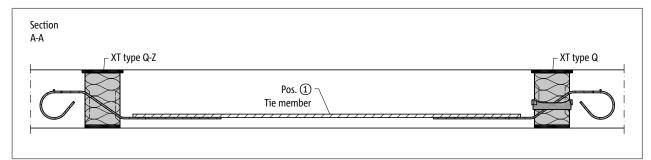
Schöck Isokorb® XT type Q-Z-V1 to Q-Z-V4, Q-V1 to Q-V4: Section A-A; one direction spanned reinforced concrete slab
